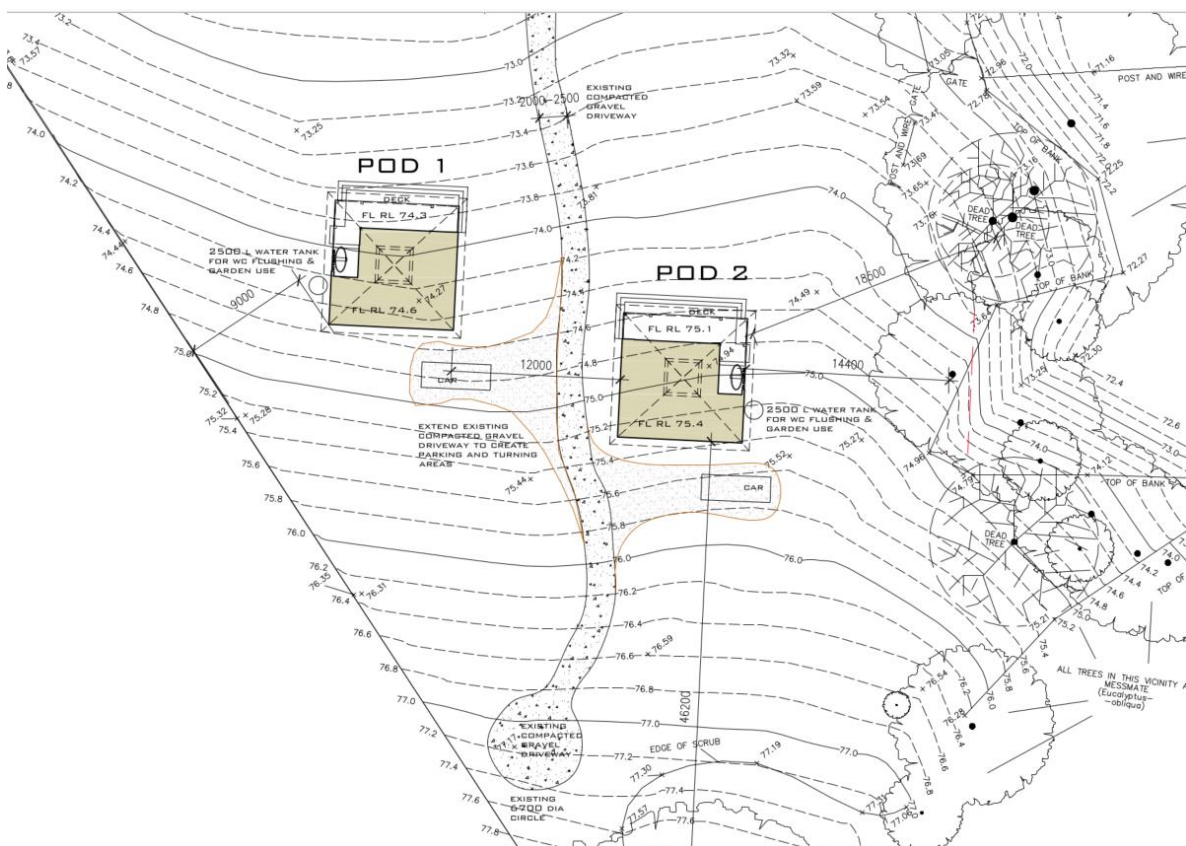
Location of proposed accommodation pods (source: Development Plans 2024)
